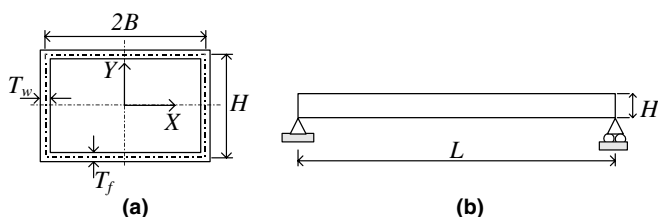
Structural geometry of box girder: (a) cross section; (b) side view.
